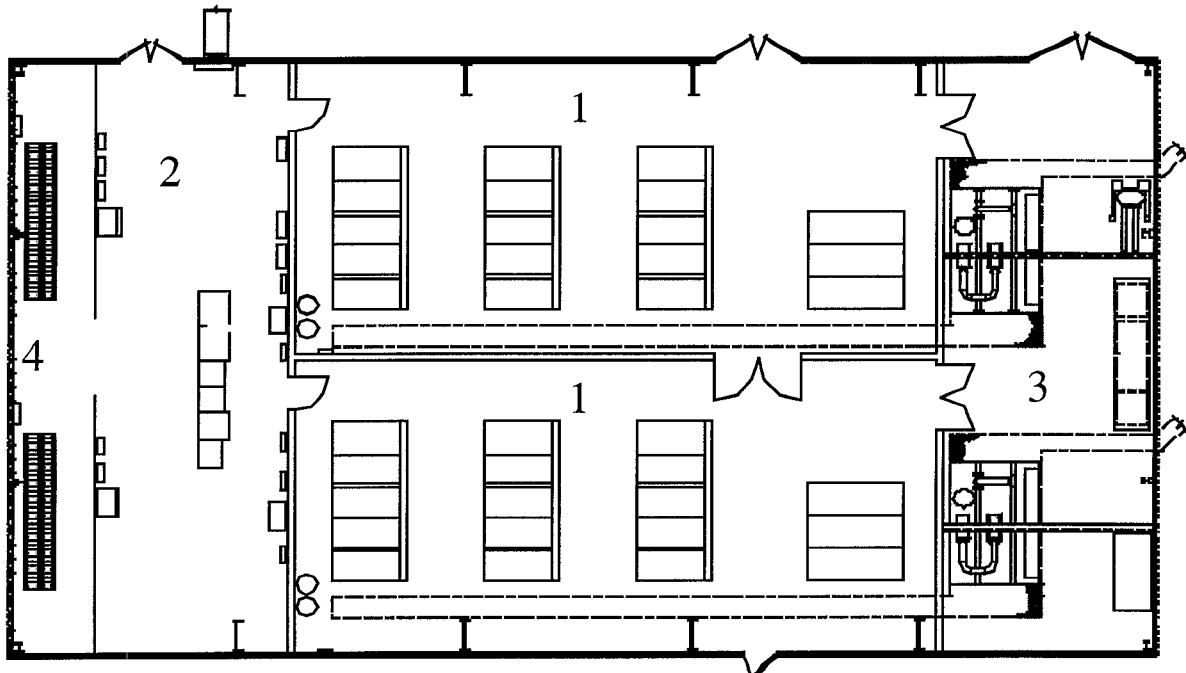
Building layout diagram of Essex +133/-41 MVA, 115 kV STATCOM equipment (not to scale)
